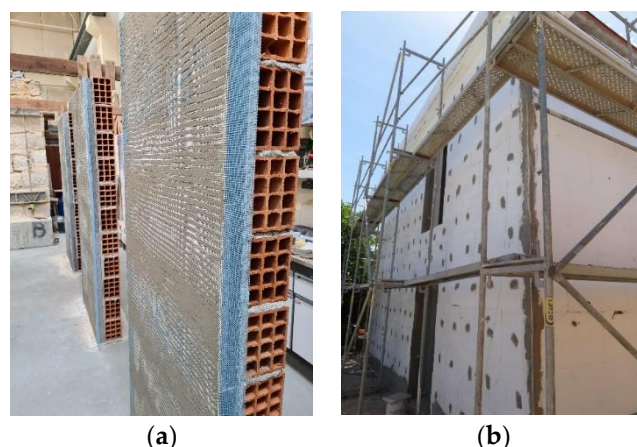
Examples of the application of external thermal insulation composite system: (a) walls in-laboratory; (b) two-story infilled reinforced concrete building.
